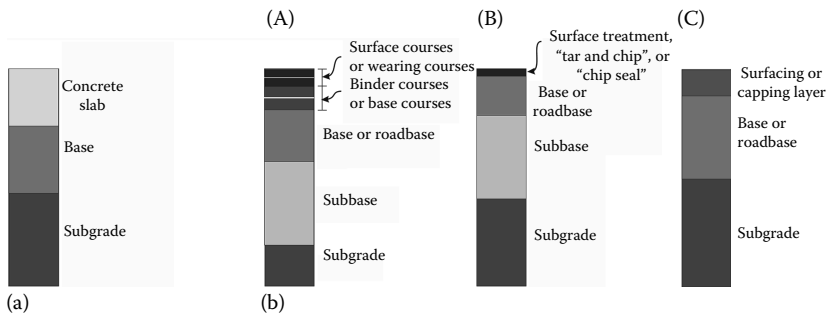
Pavement layers in (a) rigid pavements, and (b) flexible pavements ((A) asphalt, (B) surface-treated, (C) aggregate).
